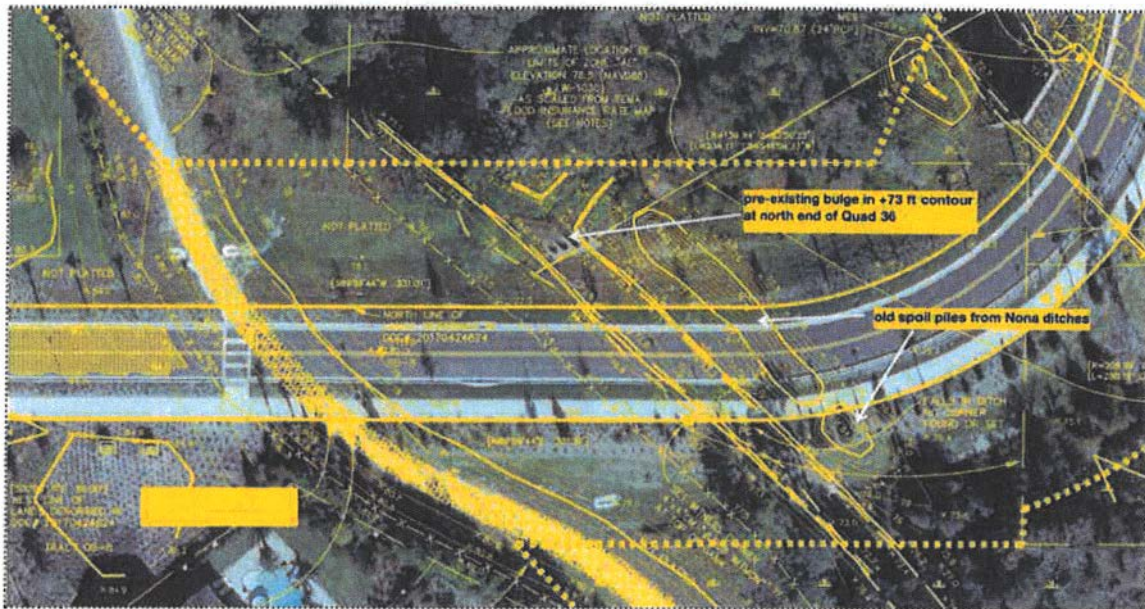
Pre-construction topo at Quad 36, note channel instability on north
